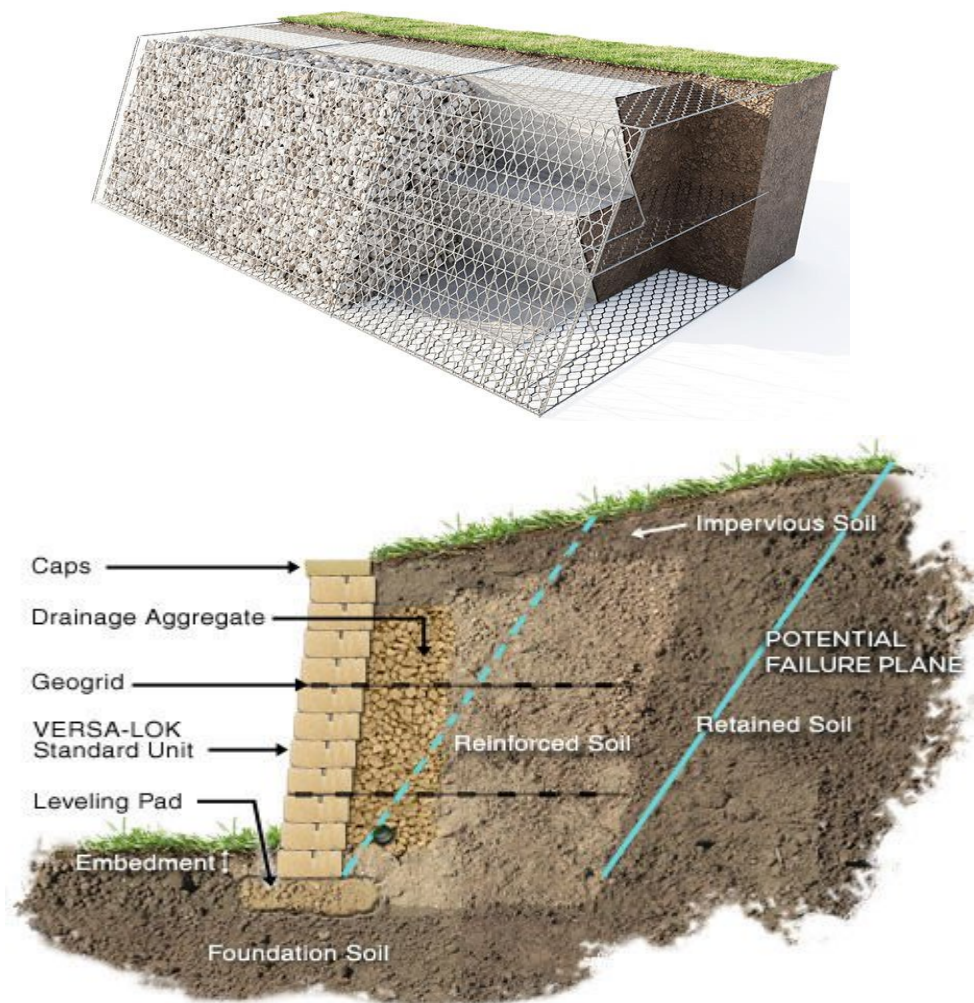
Mechanically Stabilized Earth (MSE) Wall System
